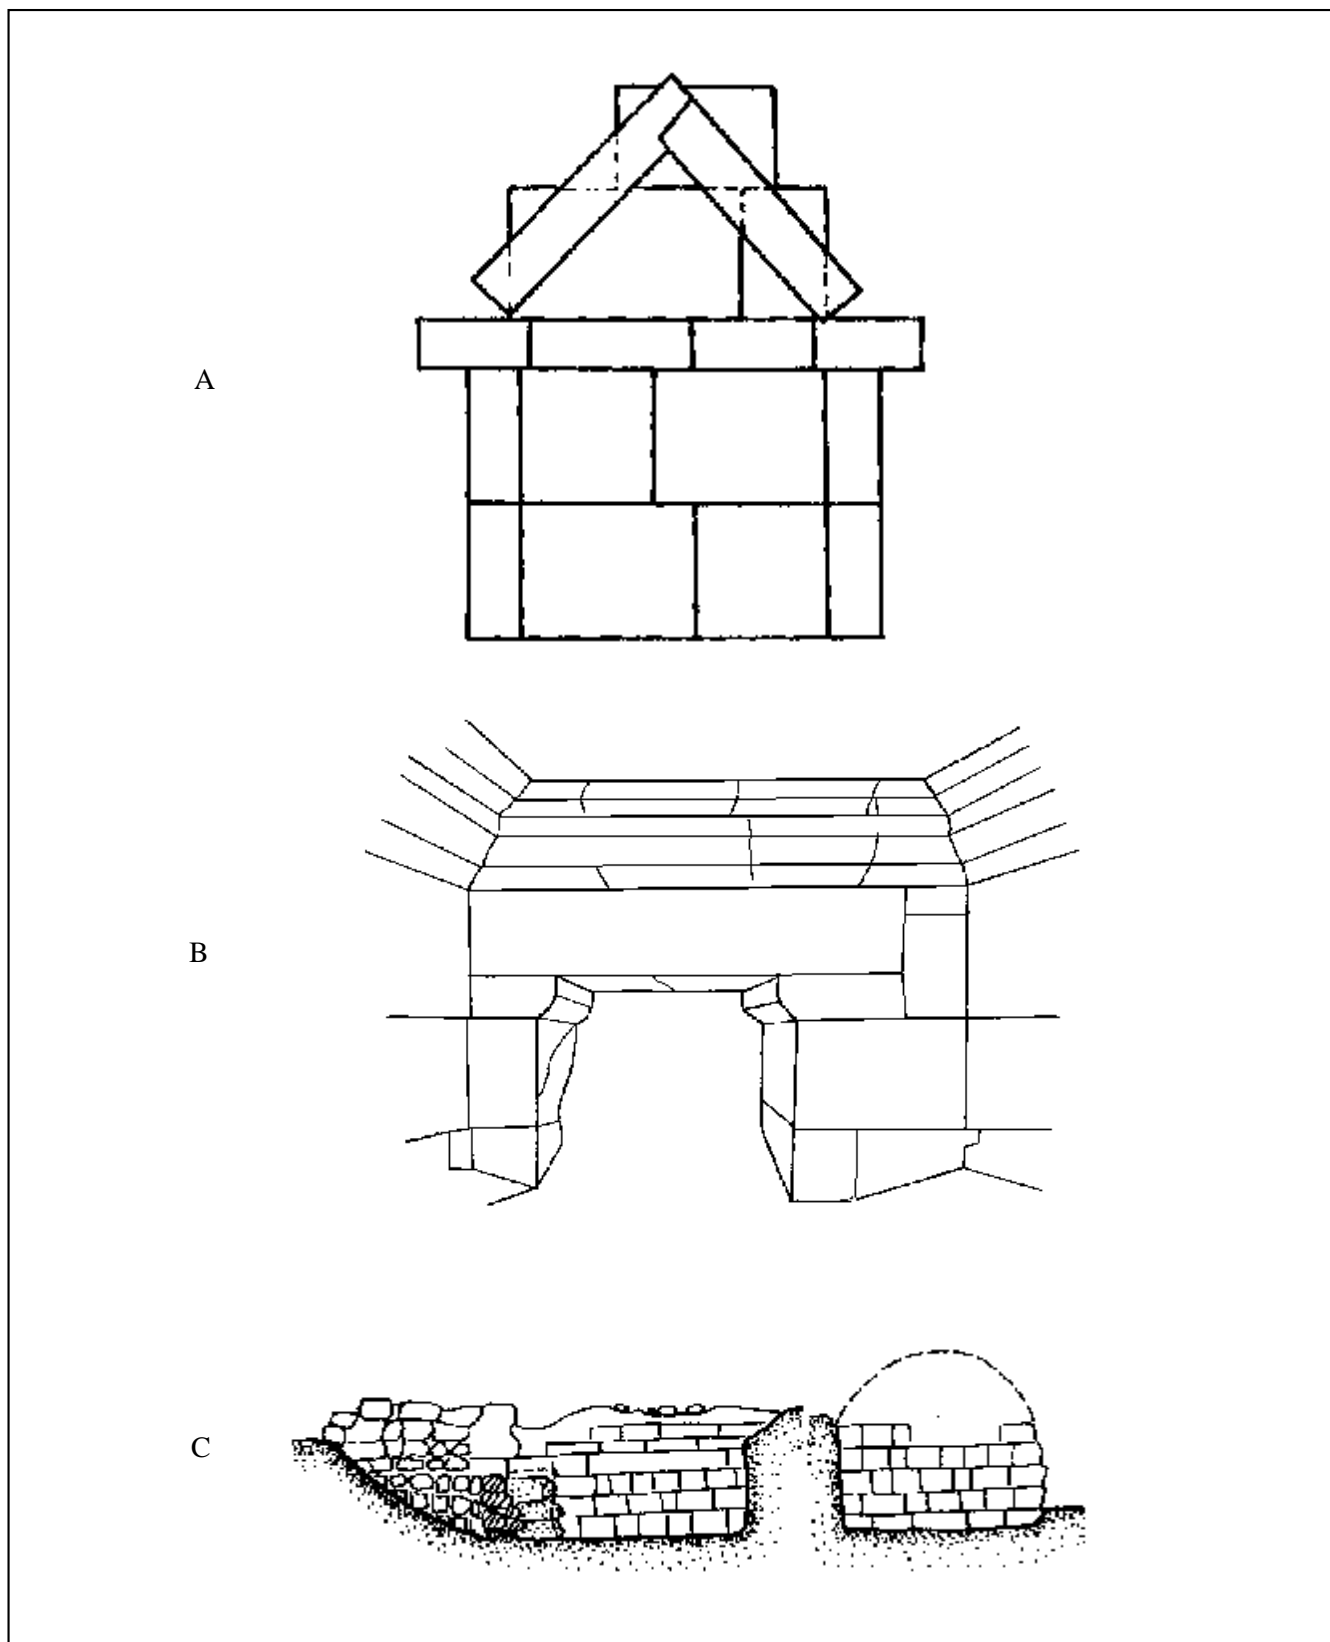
A - crypt with two-slope floors (excavation 1920); B - crypt with corbelling floors (excavation 1844); C - crypt with semicircular floors (excavation 1907).
